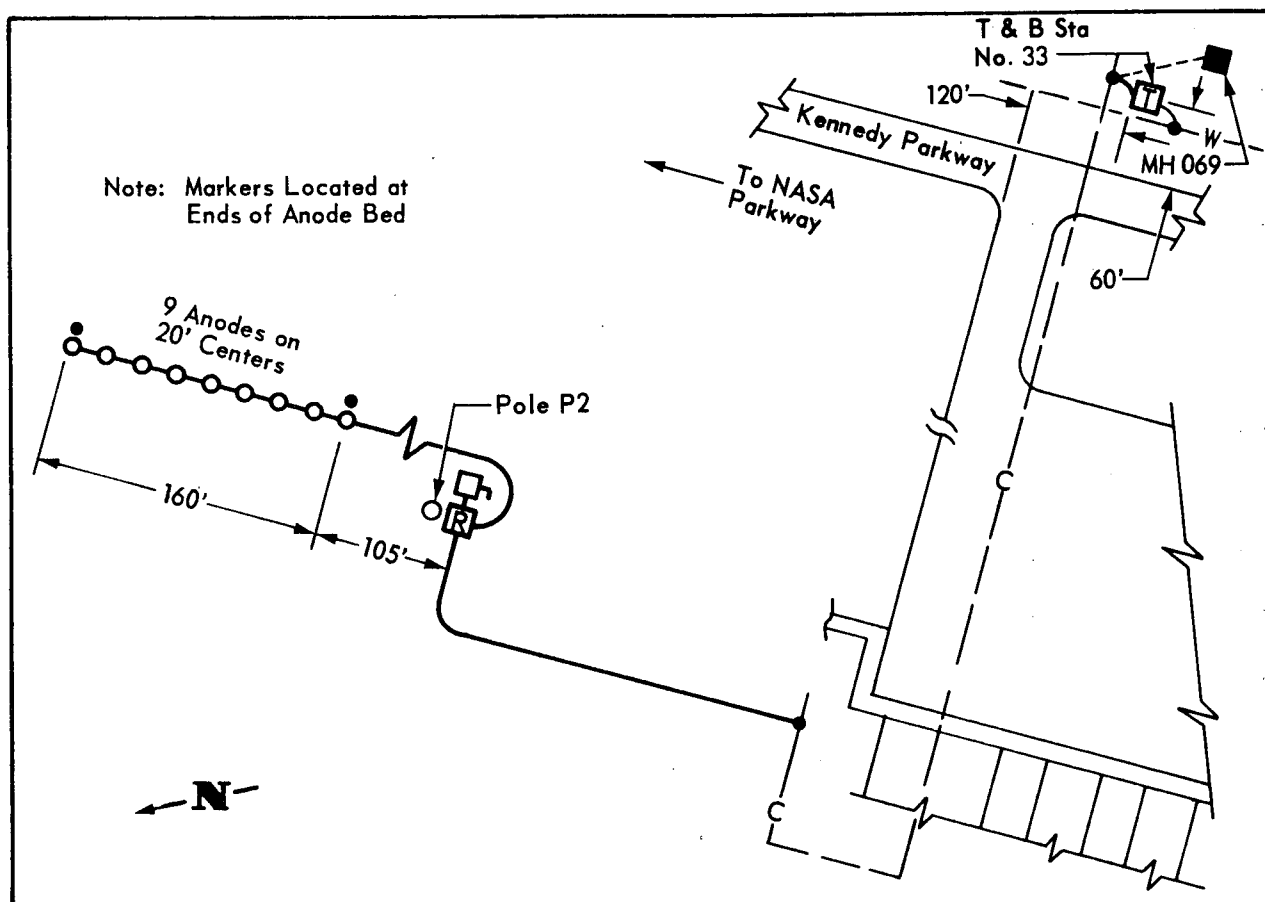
Site No. 37 and Test and Bond Station No. 33 Equipment Locator
